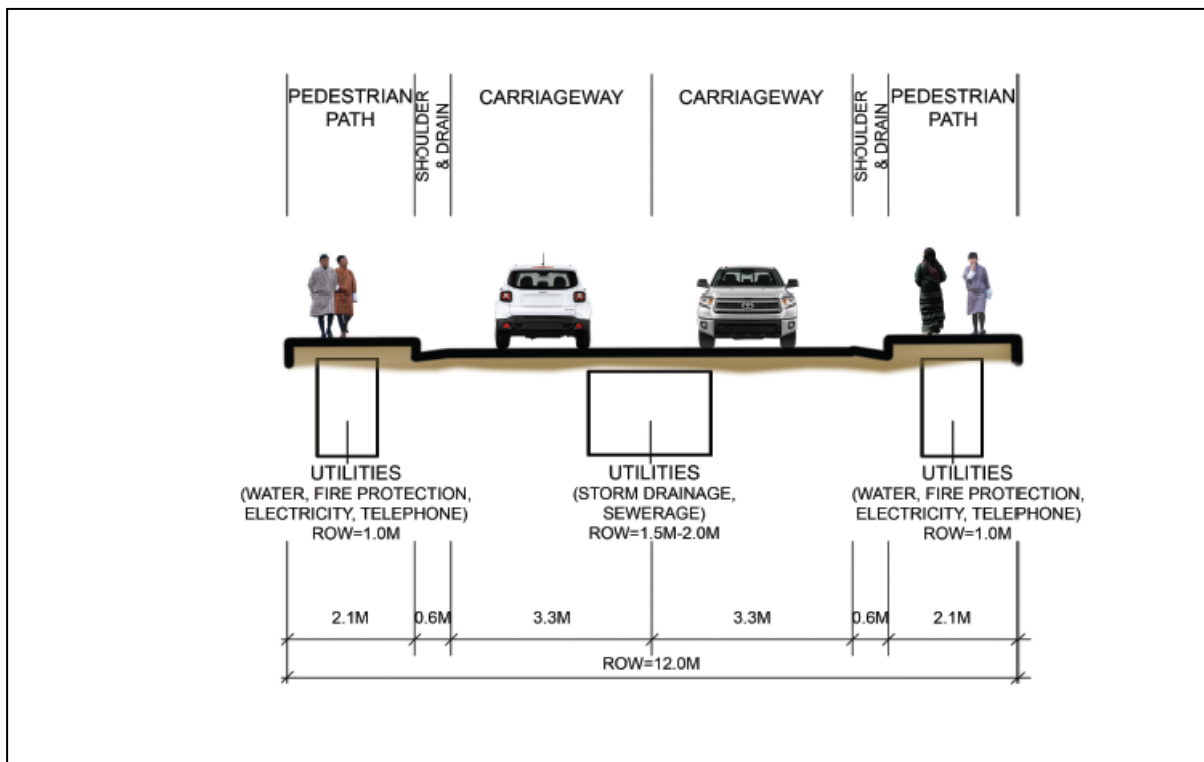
Typical Road Section 5 (Two lanes, cycling lane, parking on one side)Figure 9: Typical Road Section 6 (Two lanes)
